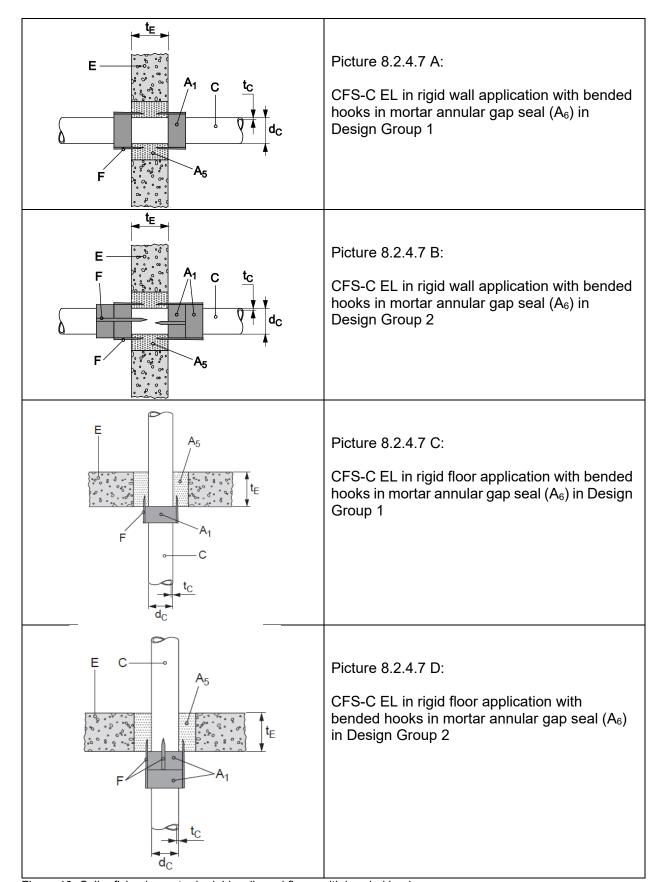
Collar fixing in mortar in rigid walls and floors with bended hooks
